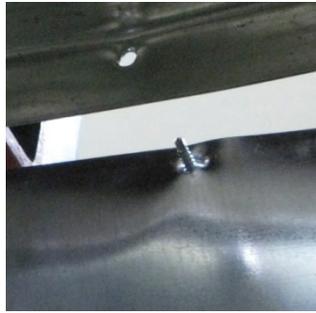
Sheathing Screw Pull-out Failure
